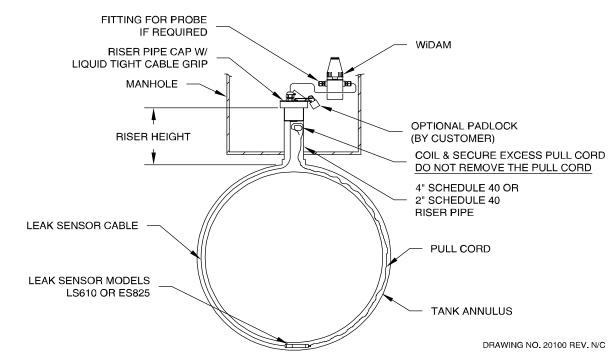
Dry Leak Sensor Installation in Fiberglass Tanks
